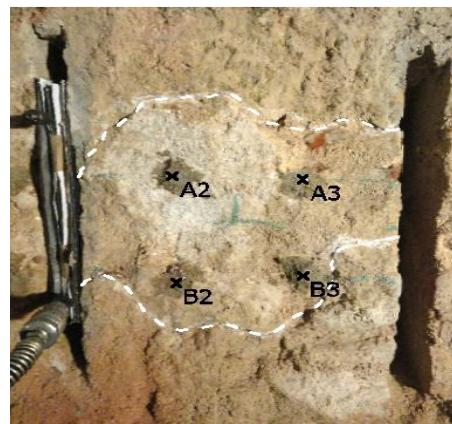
Flat-jack shear test on irregular masonry wall (Simões et al., 2012).
